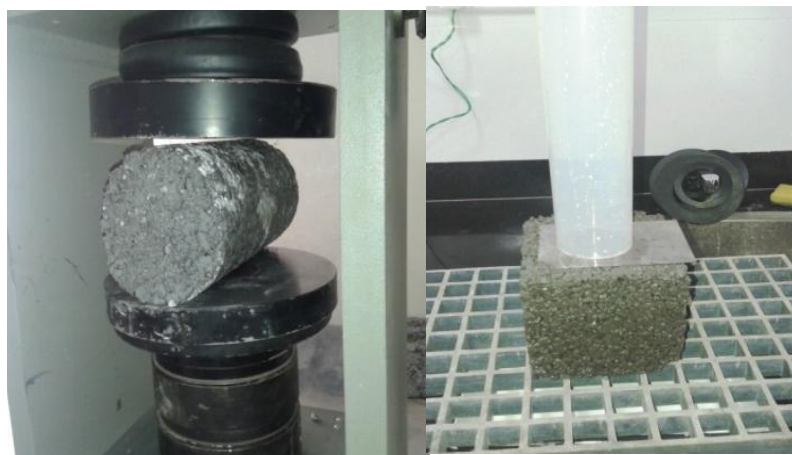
(b) Split Tensile and Falling Head Permeability Testing of pervious concrete specimen
